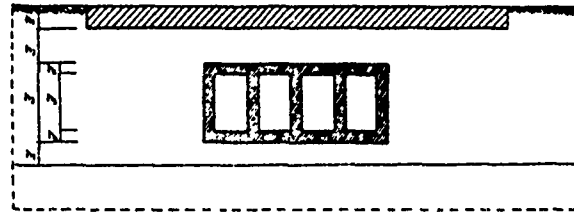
Typical Manufacturing Process-Type Barricade of Sandwich Construction, 3 Feet of Sand, Plus 9 Inches of Roof Deck Approximately 30 Feet High
